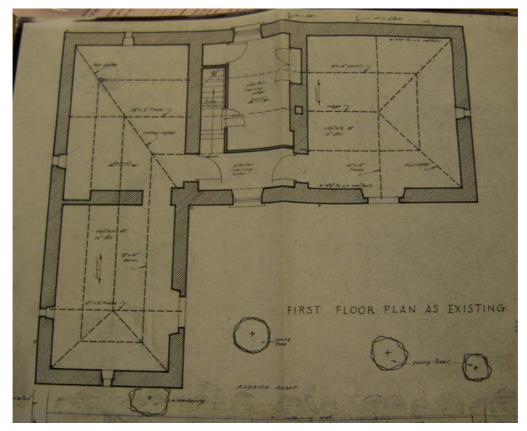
Coach House first floor plan as existing in 1966 (BDB 33/12/9 1966-9)
